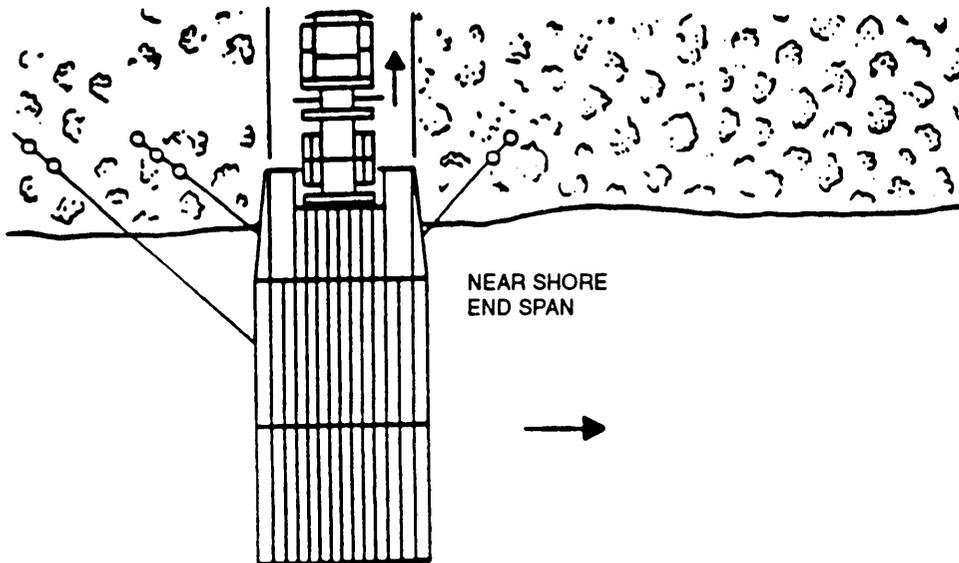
Bridge Assembly Successive Bay Method (Sheet 3 of 4).
